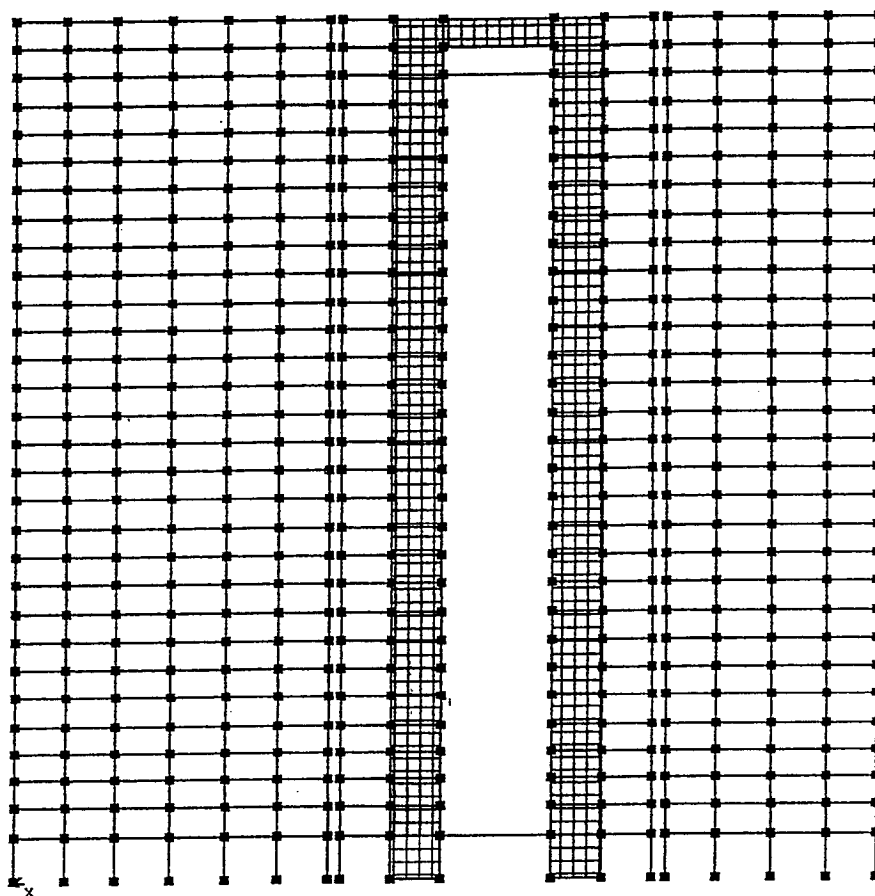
Retrofitted S-K Redesigned Building, Coupled Shear Walls
